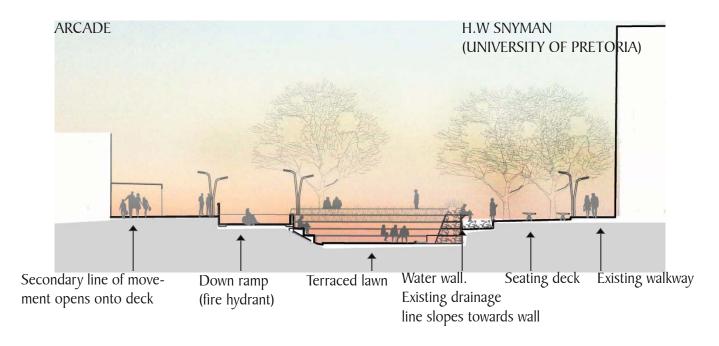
Section D - (Master plan) Scale 1:250 (Author, 2008)
